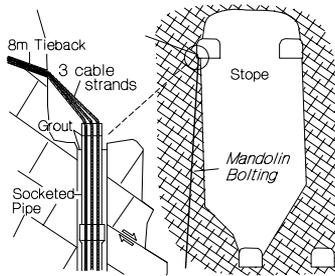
Mandolin bolting approach used in Australia (after Cutjar et al., 1985)
